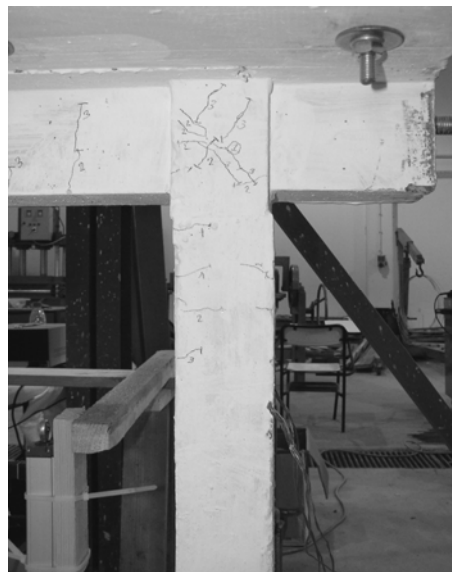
Shear cracks on the first story south face east column at the end of the third loading group
